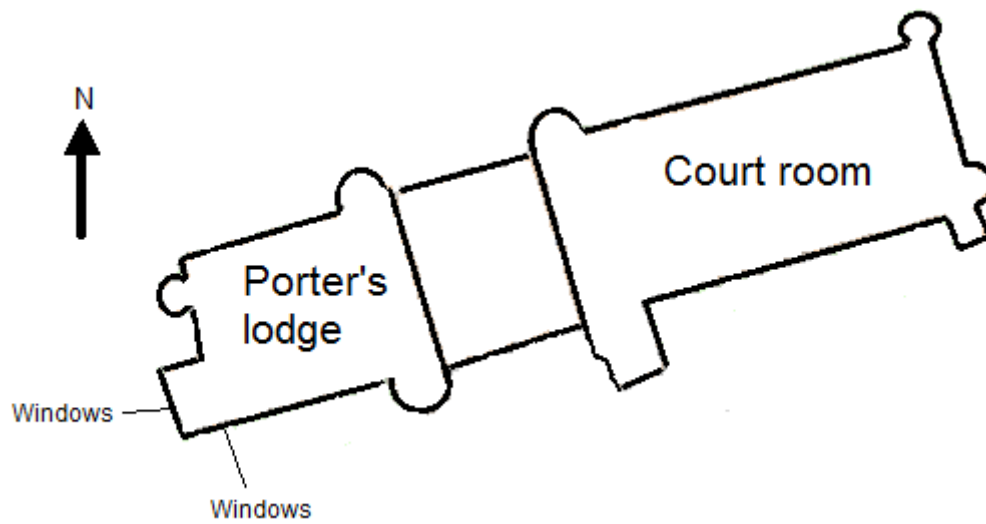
Sketch plan of the Gatehouse, showing the approximate position of sampled windows
